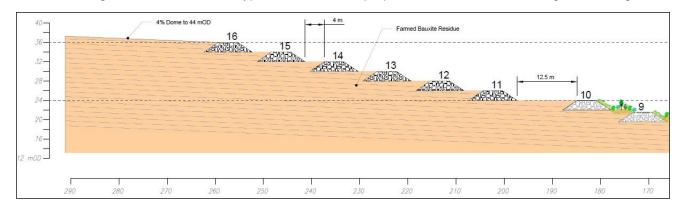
Typical Section of BRDA Raise from Stage 11 to Stage 16 (without side-slope closure capping)
